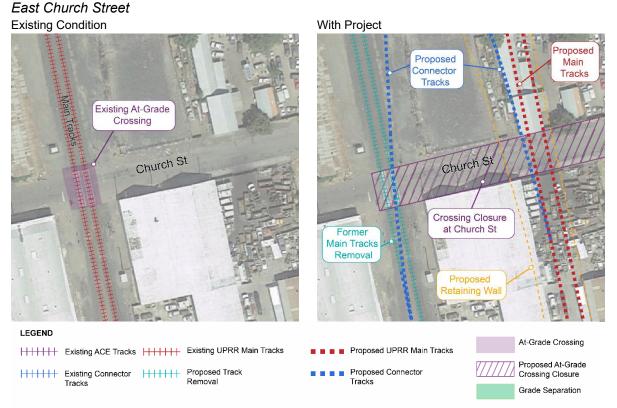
Existing and Proposed Track Configuration (East Weber Avenue to South of East Church Street) – Sheet 3 of 3
